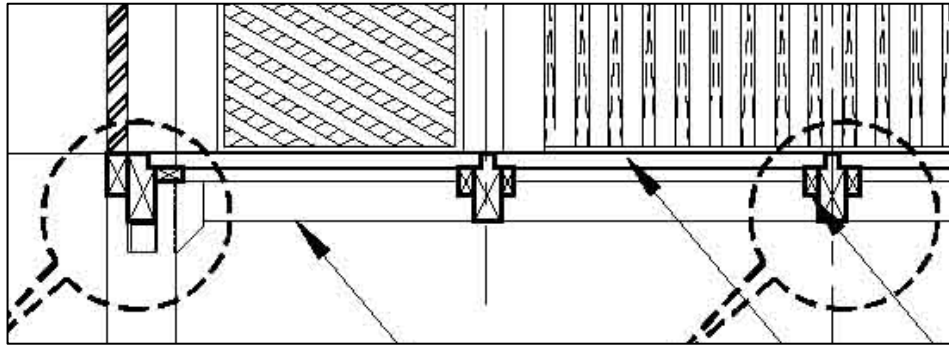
Flexibility in Choosing the Wall Panels Based on the Floor Plan
